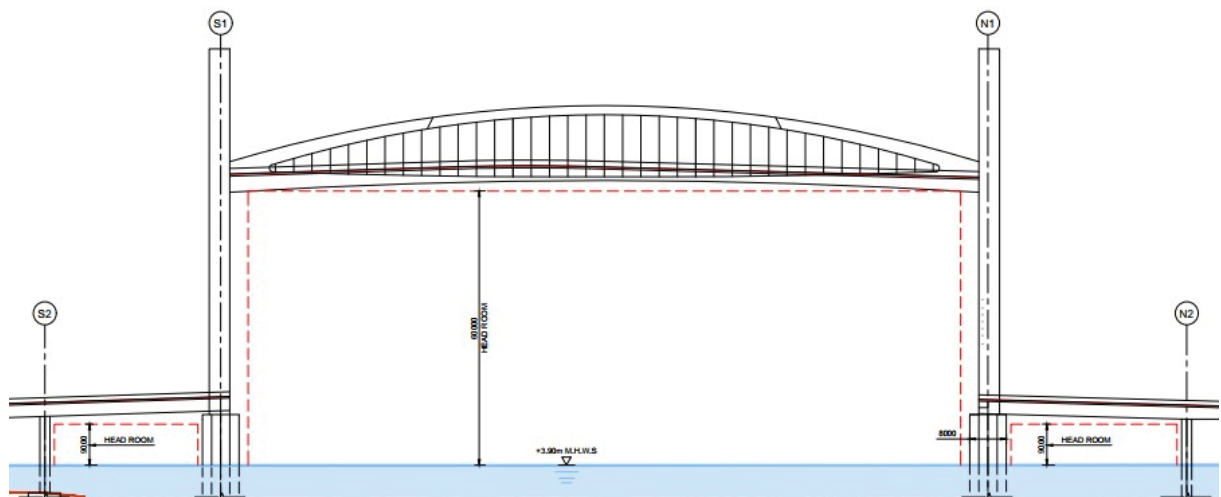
Elevation of the proposed lifting bridge, as a tied arch, in the open position. [From Ref 18.]
